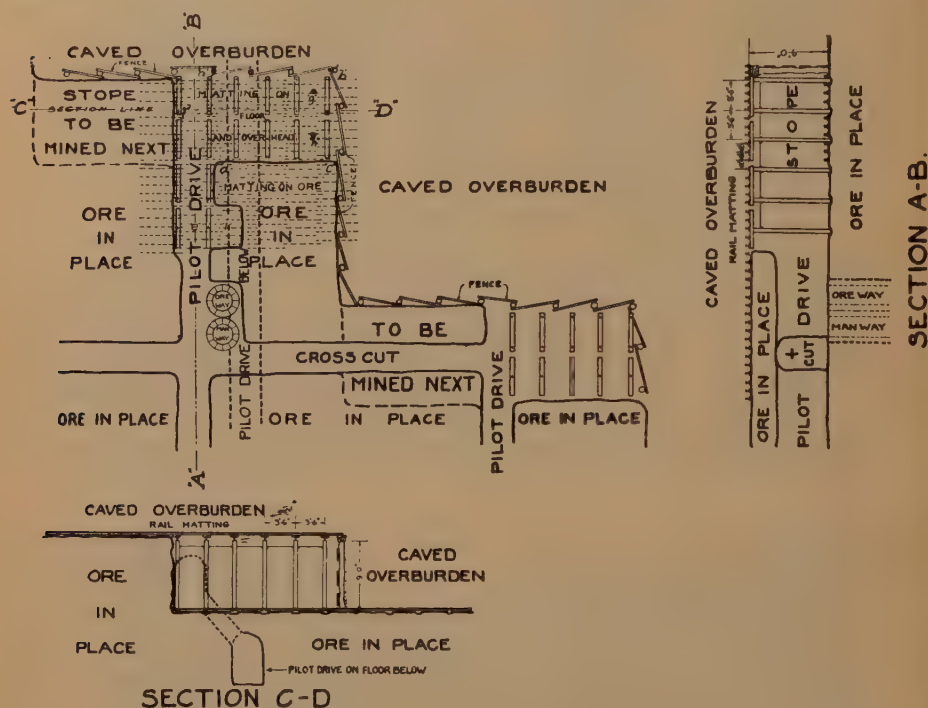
TOP-SLICE MINING, PLAN AND SECTIONS.
